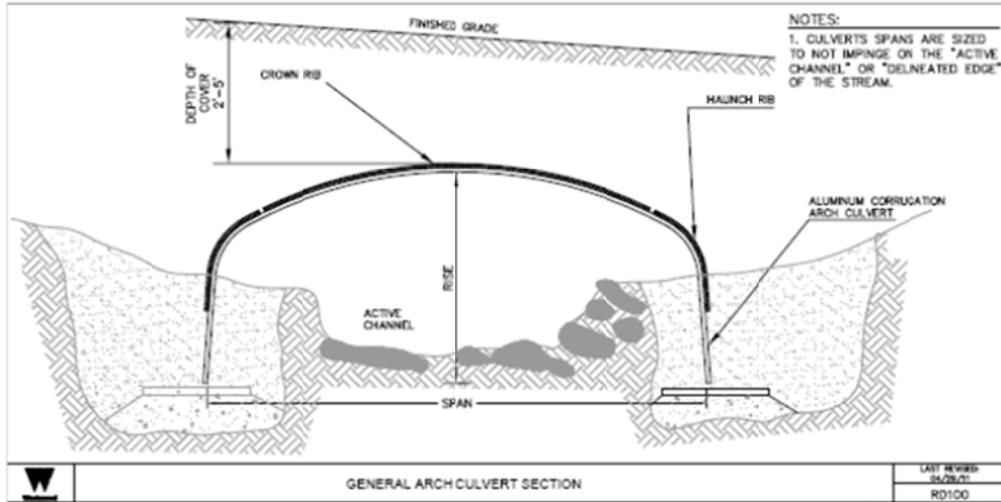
Example of an open-bottomed culvert or arched bridge that would be built above the delineate edge of the stream.
